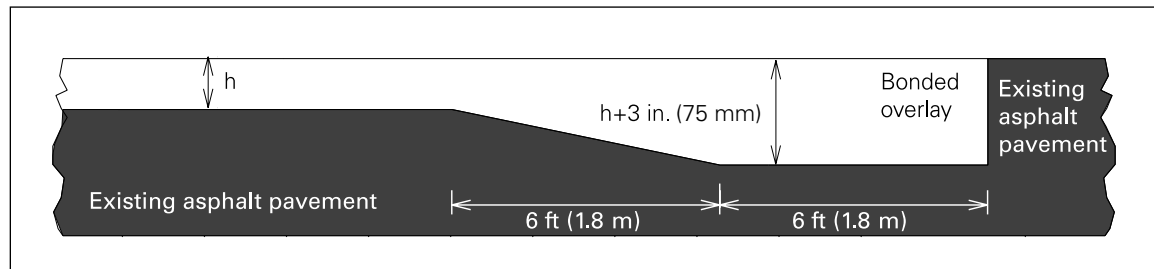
Mill and fill transition for bonded concrete overlay of asphalt or composite pavement (adapted from ACPA [1998])
